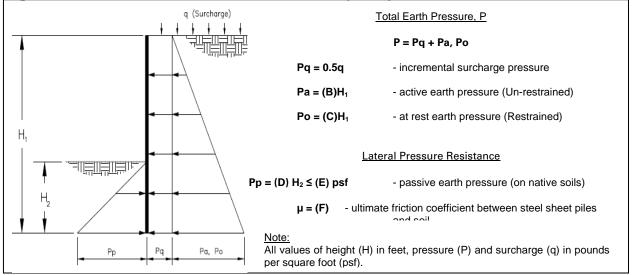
, Lateral Earth Pressures on Temporary Cantilever Wall
